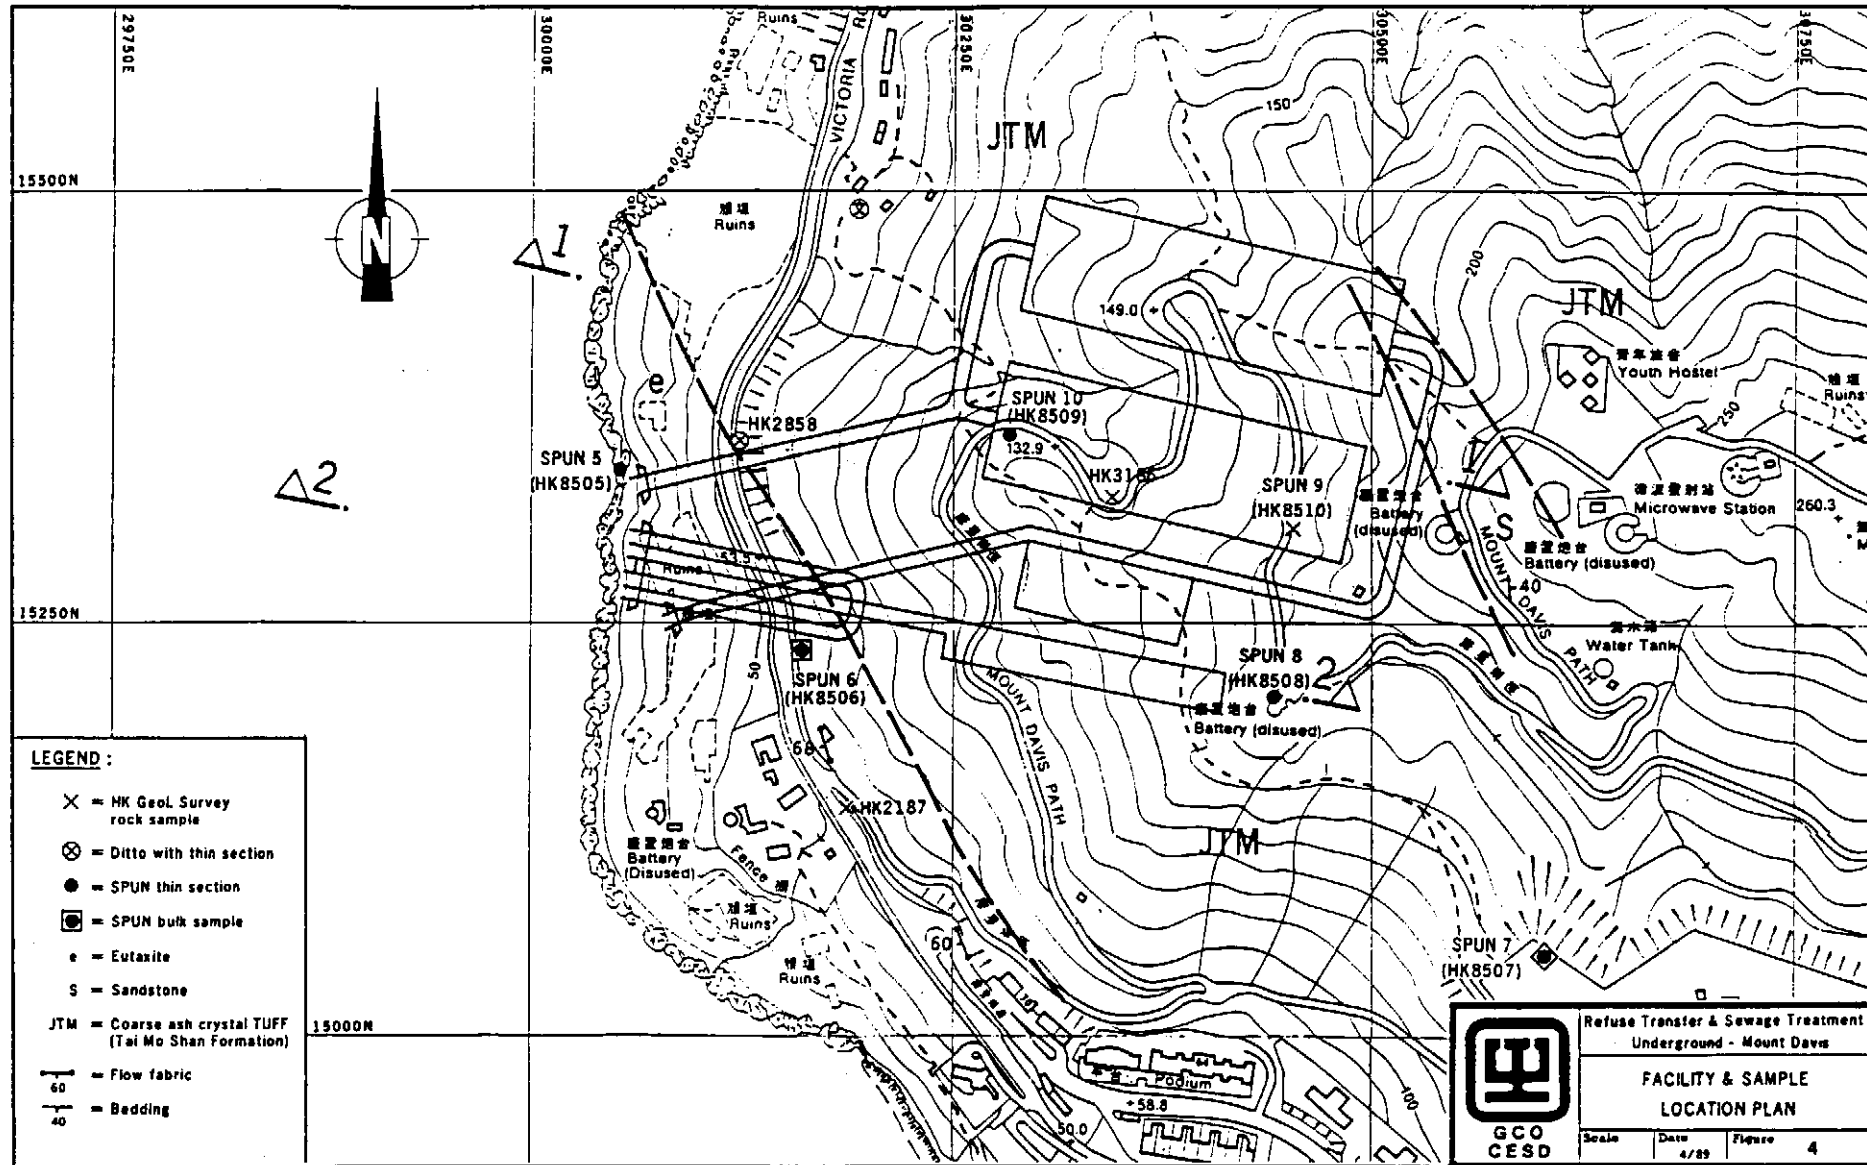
Geology and Sample Location Plan - Proposed Mount Davis Underground Facilities (Approx. 1 : 3000)
